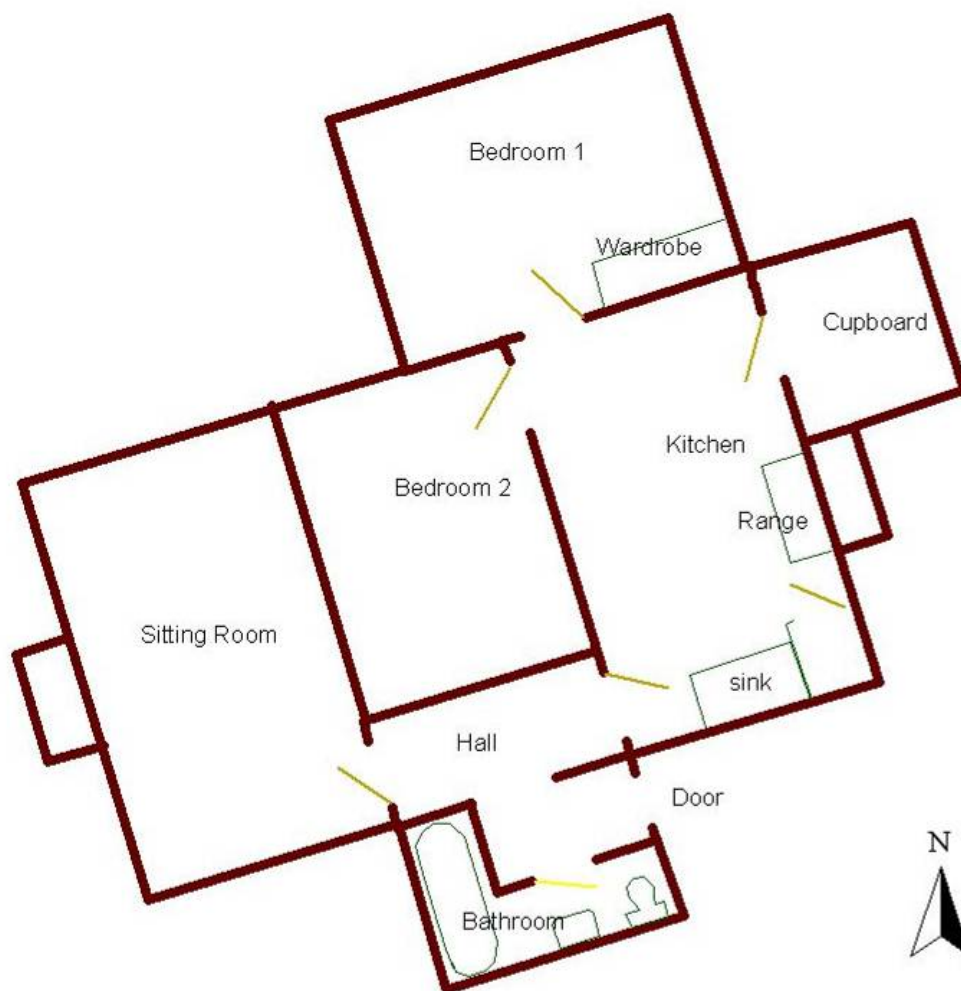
The bungalow – sketch plan (as existing). Not to scale.
